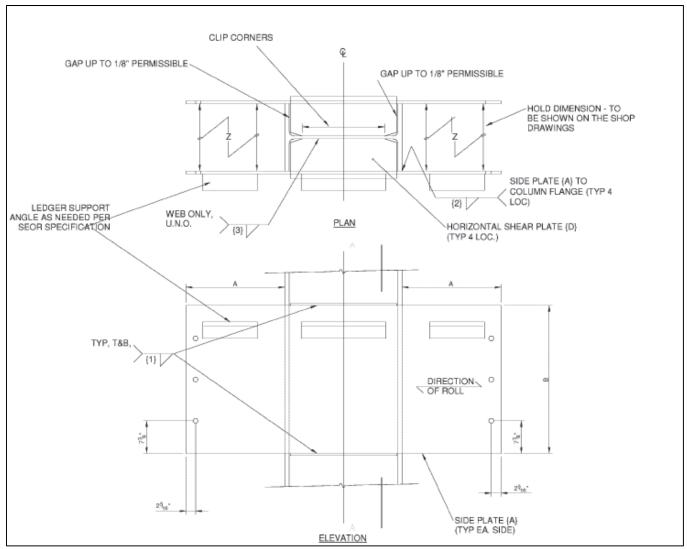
Elevation and plan view of a Sideplate Frame System. Image courtesy of Ellerbe Becket.
